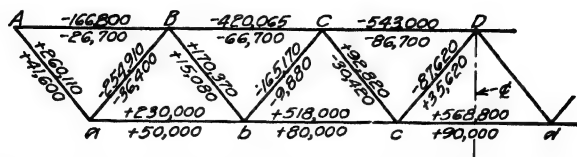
Maximum and minimum stresses, deck Warren truss. Dead load and Cooper's E-50 loading.
